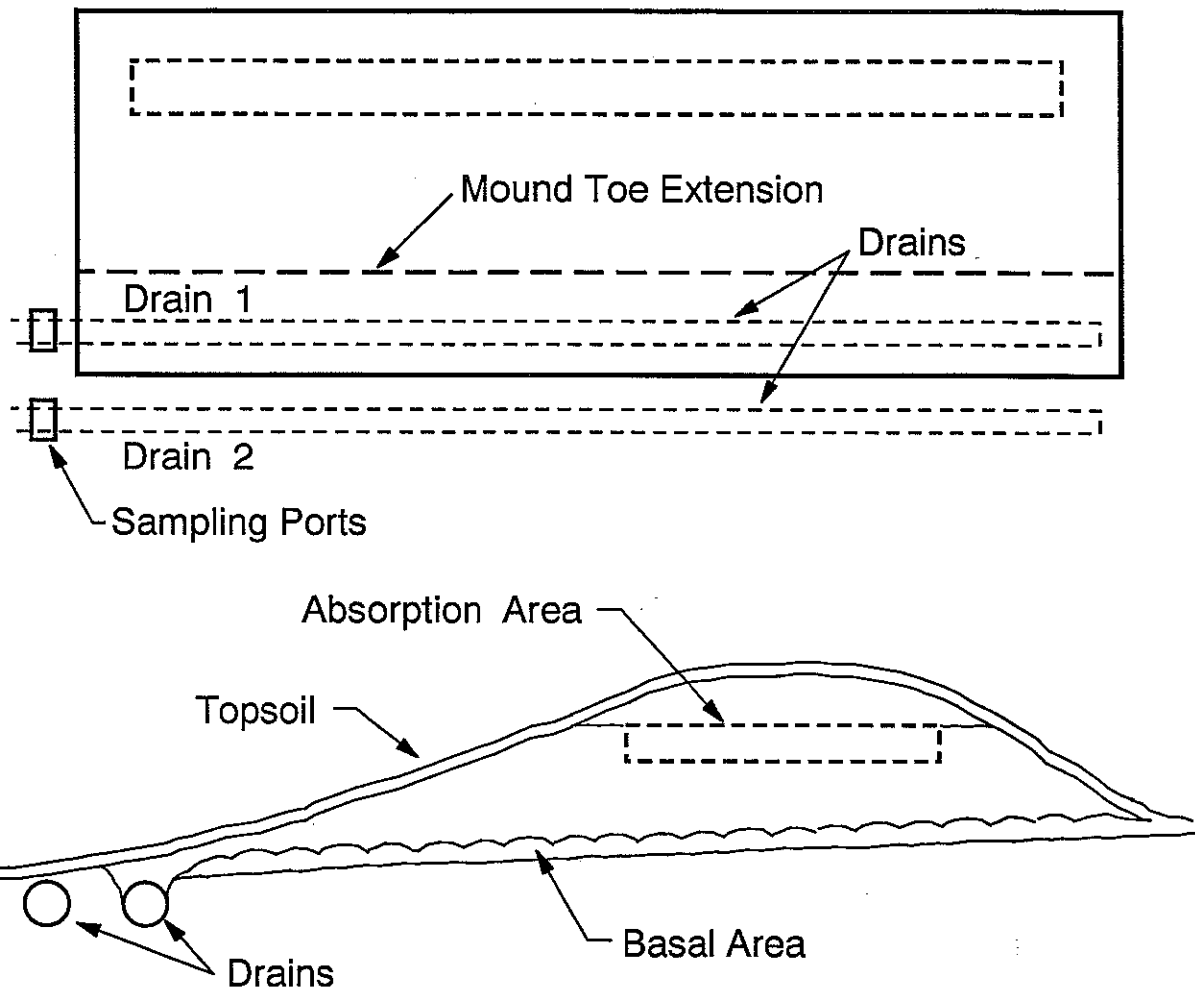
Plan view and cross section of a mound showing two drains and mound toe extension.
